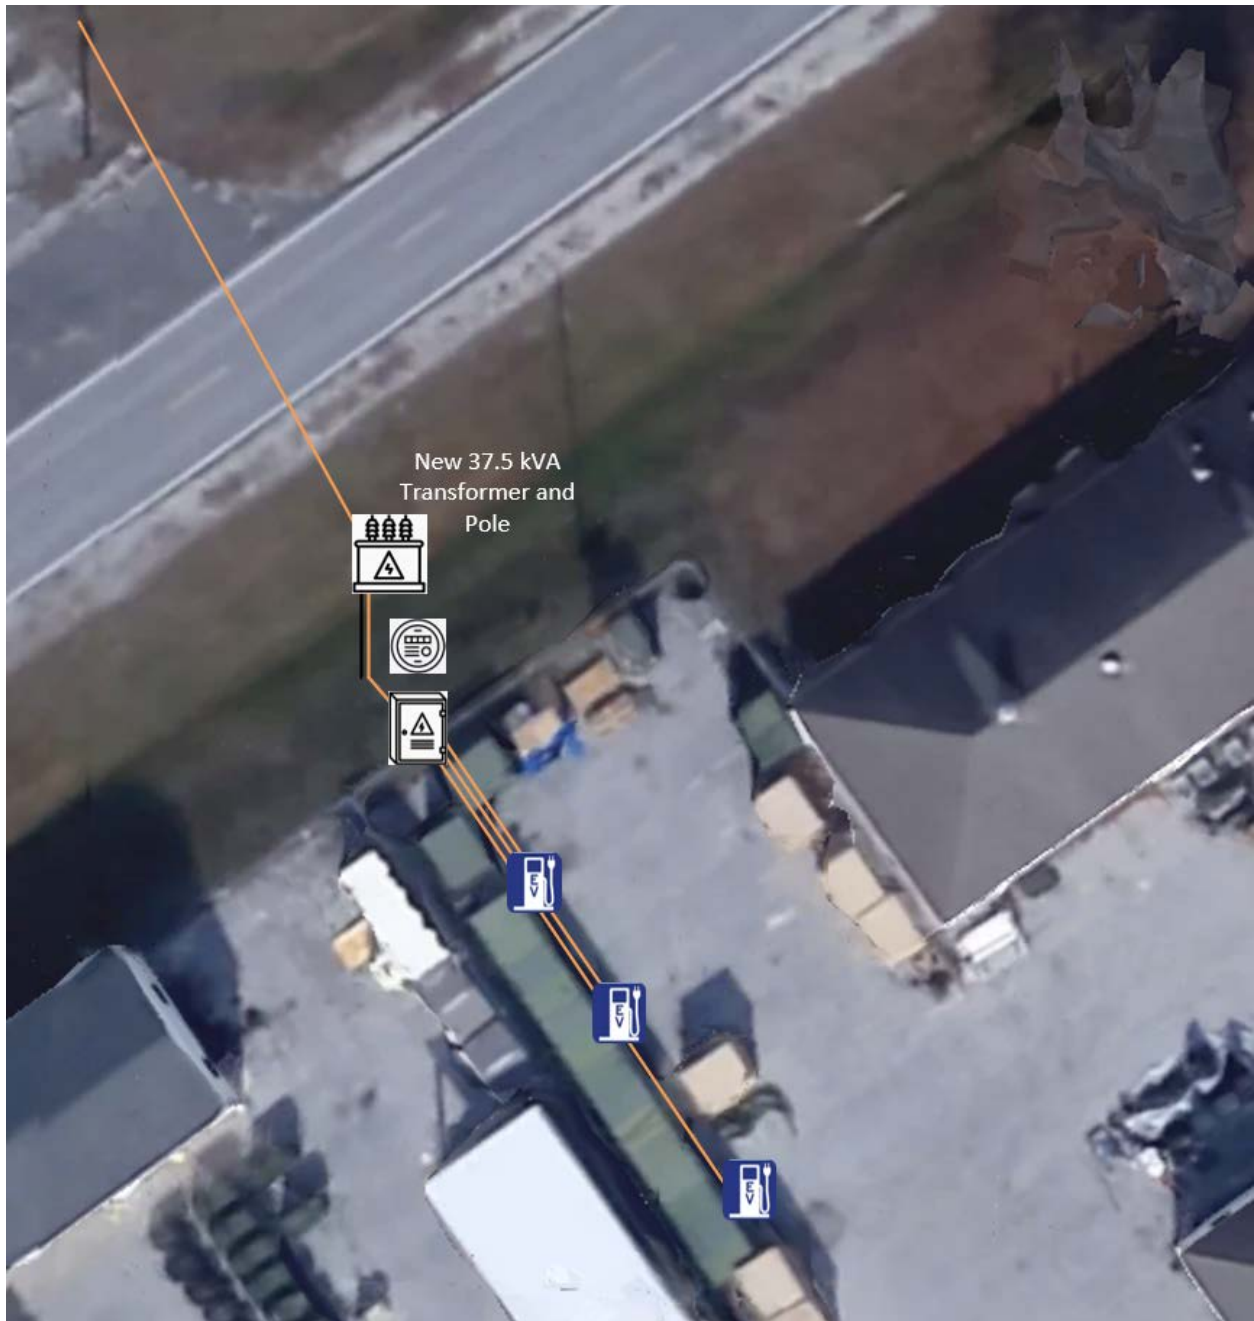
Recommended configuration for Building 1308 EVSE, new pole, and electrical service
